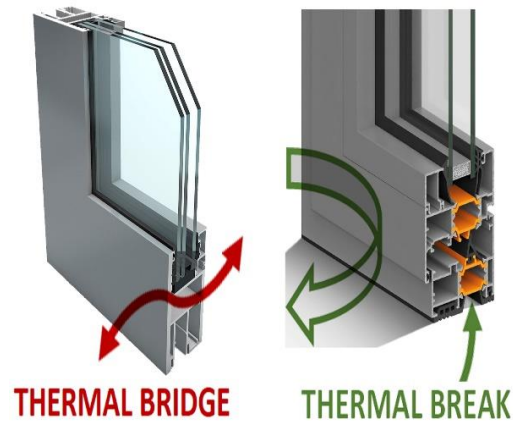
Thermal bridge & thermal break at aluminium windows, Source: The author.
